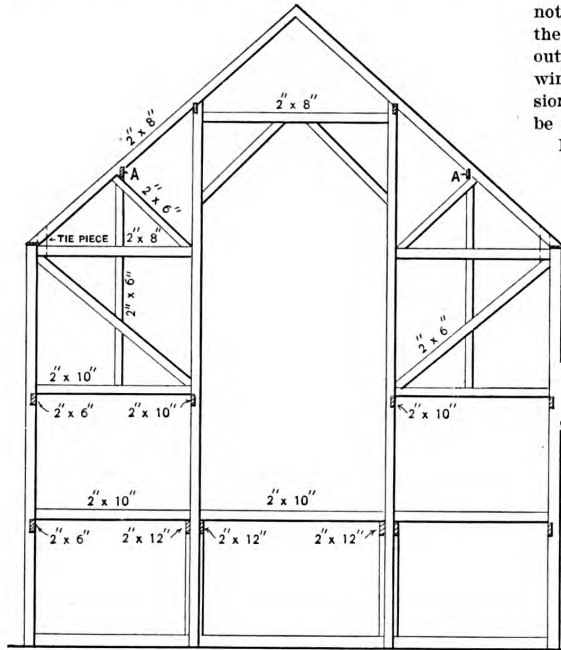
Cross Section Showing General Method of Framing, Bracing, &c.
